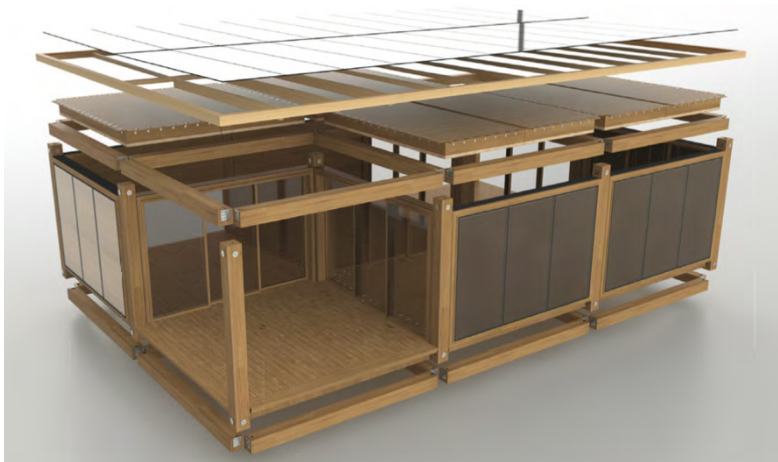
Construction design of Ecolar prototype¹¹⁶
